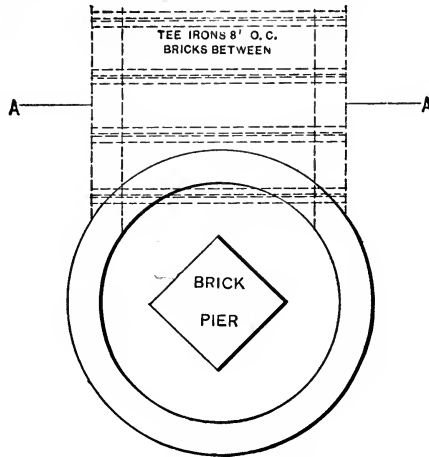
Brick Furnace Foundation with Underground Cold Air Box.
